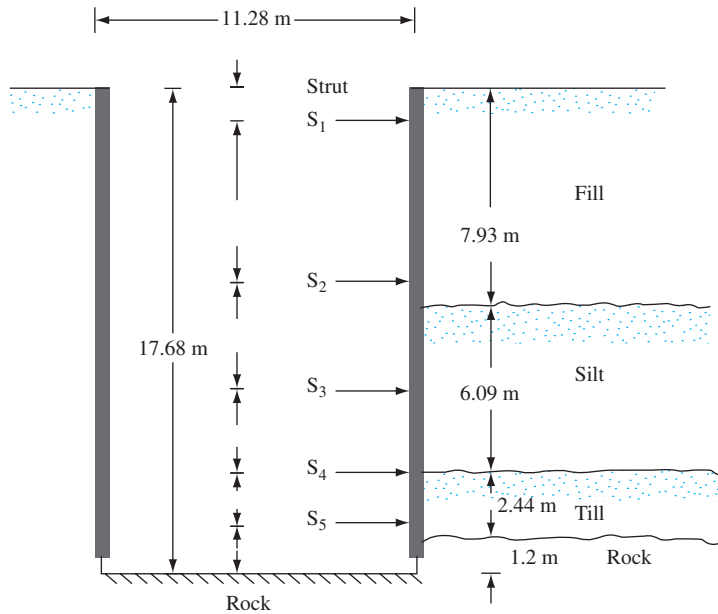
Schematic diagram of test section B for subway extension, MTBA
